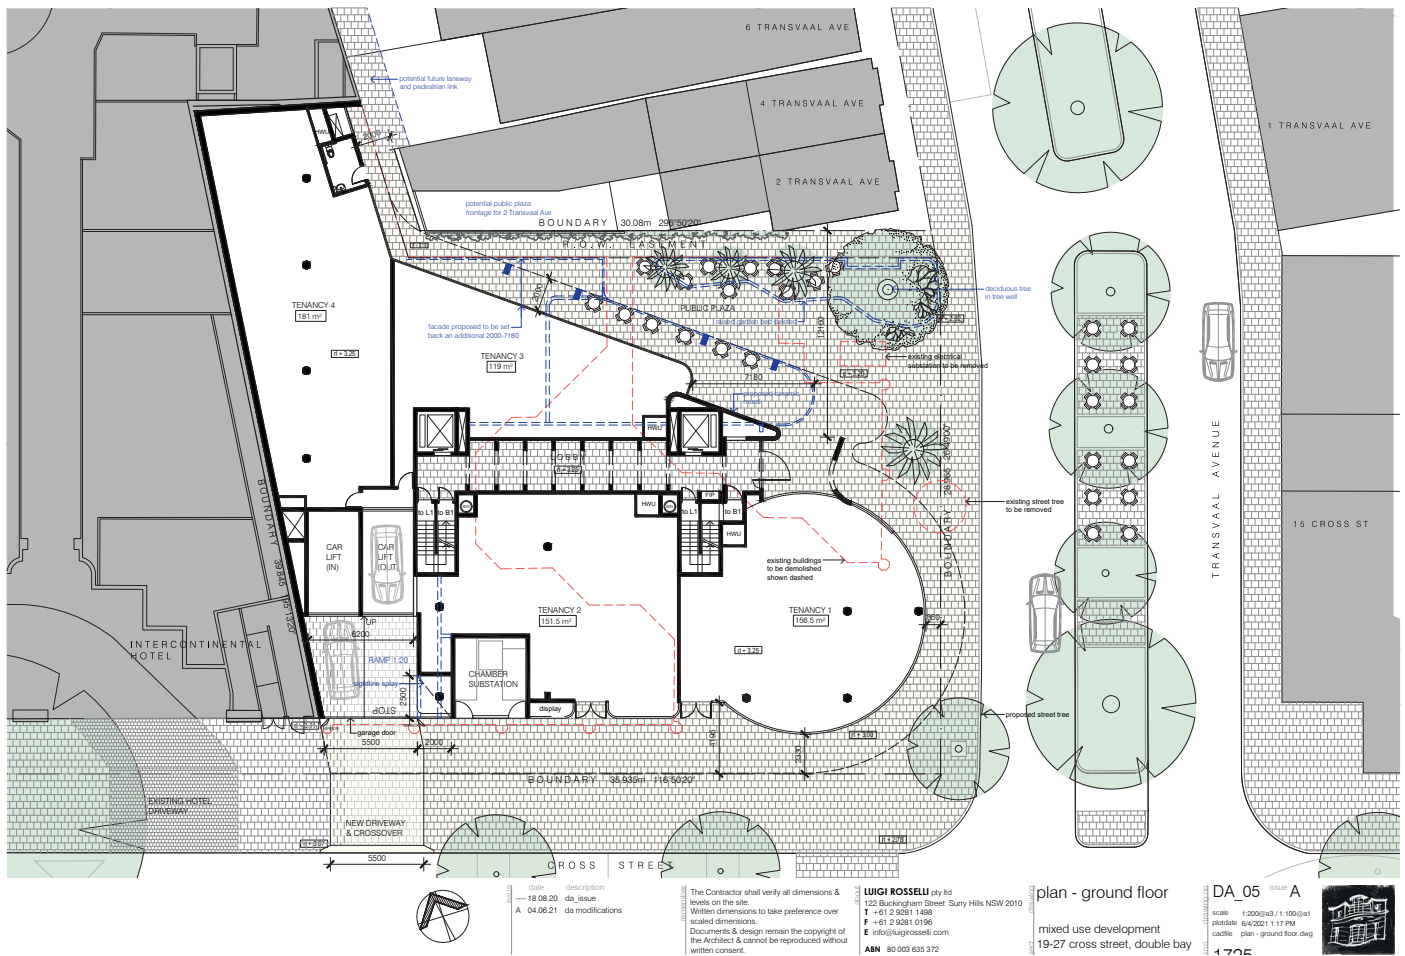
Ground Floor Plan (courtesy of Luigi Rosselli Architecture)
